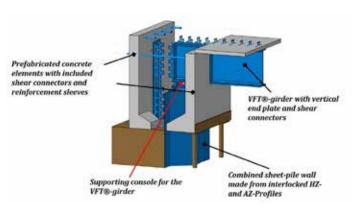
Concept for a modular solution of sheet pile abutment using precast formwork elements, VFT-girder with shear studs.
